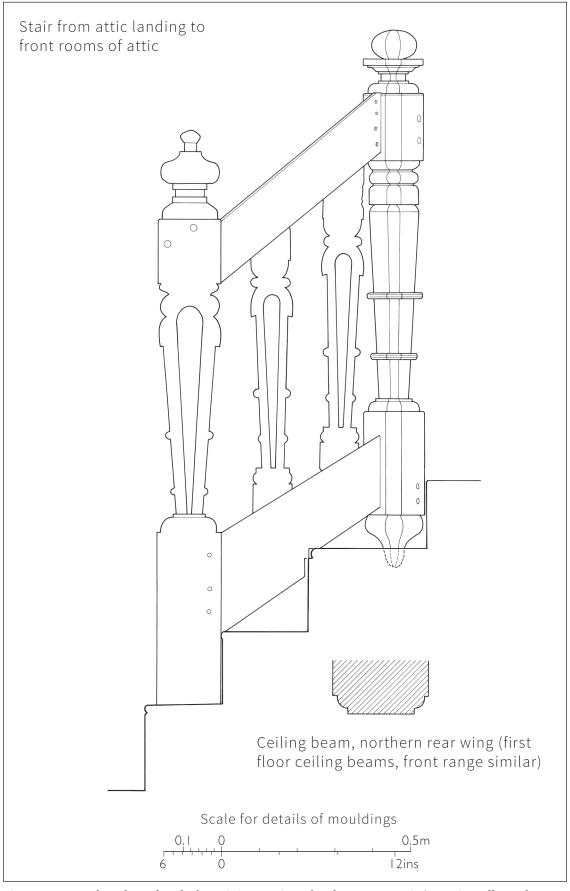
5 Market Place, detail of surviving section of 17th-century stair (Drawing Allan Adams © Historic England).
